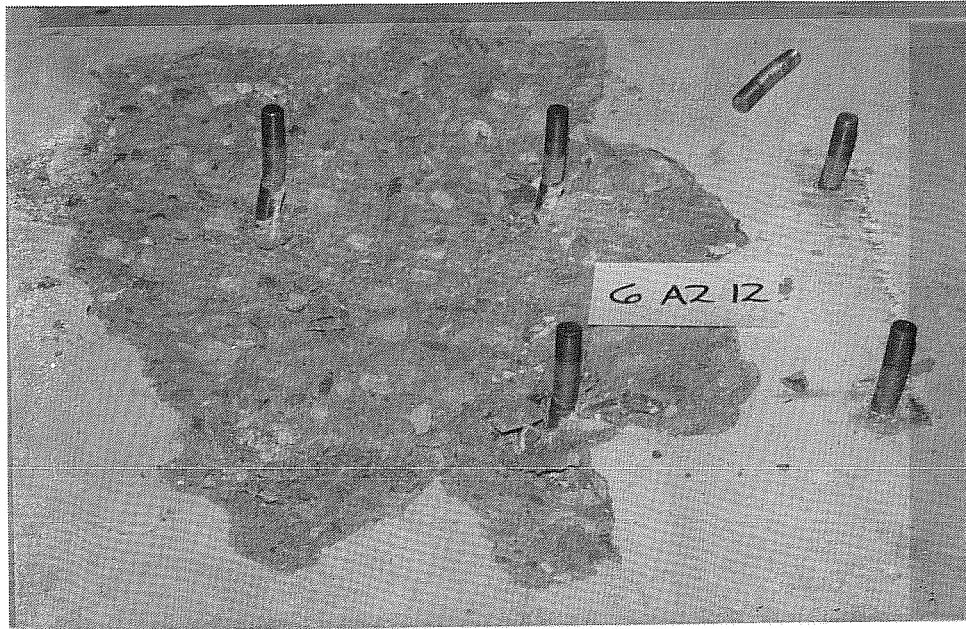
Severe Surface Spalling for Adhesive Anchors
